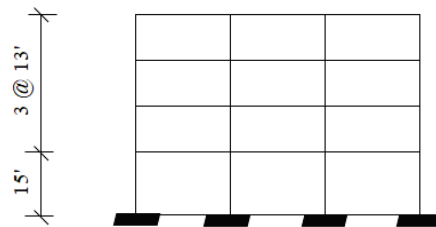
Baseline RC moment frame building typical 4-story elevation.
